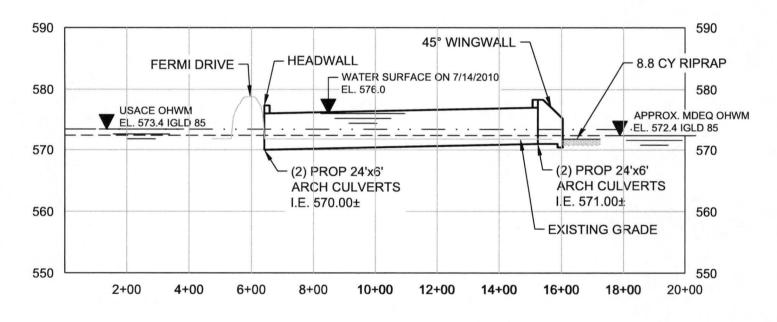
B CONSTRUCTION AREA 5 PROFILE OF PROPOSED SOUTH CANAL CULVERTS
